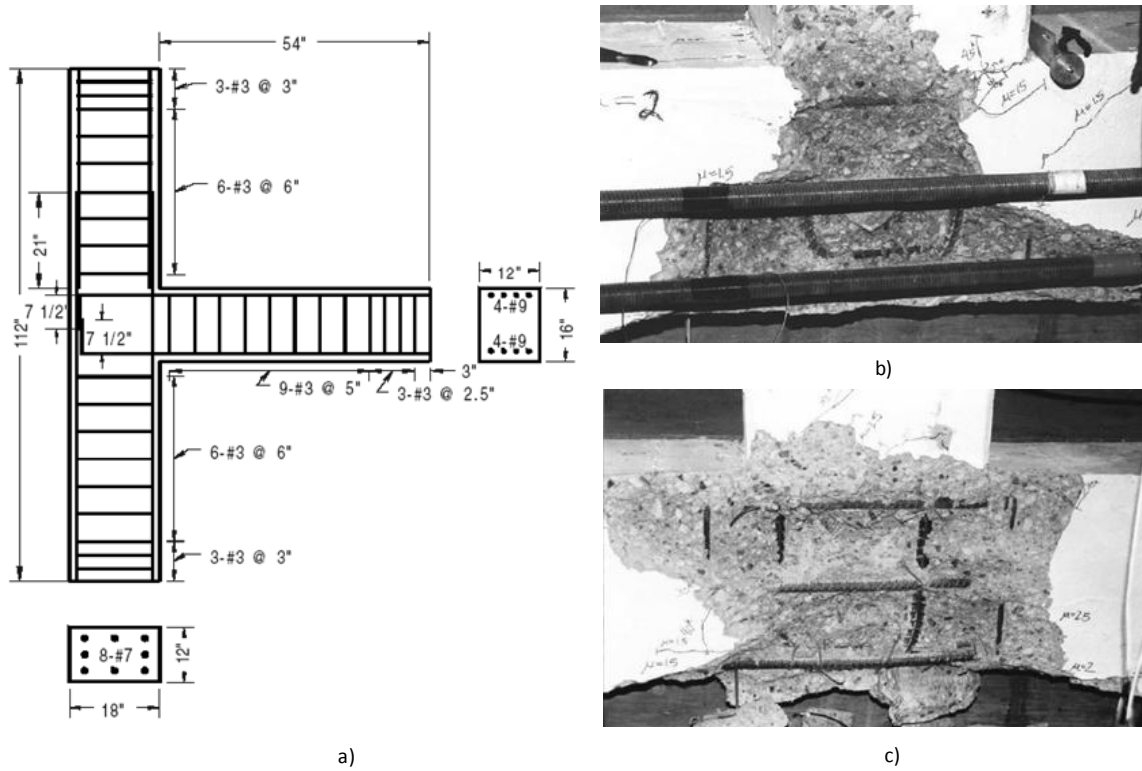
Experimental study by Clyde *et al.* [29]: a) details of units; b) damage to specimen under  $0.10f_c'A_g$  axial load level; c) damage to specimen under  $0.25f_c'A_g$  axial load level
